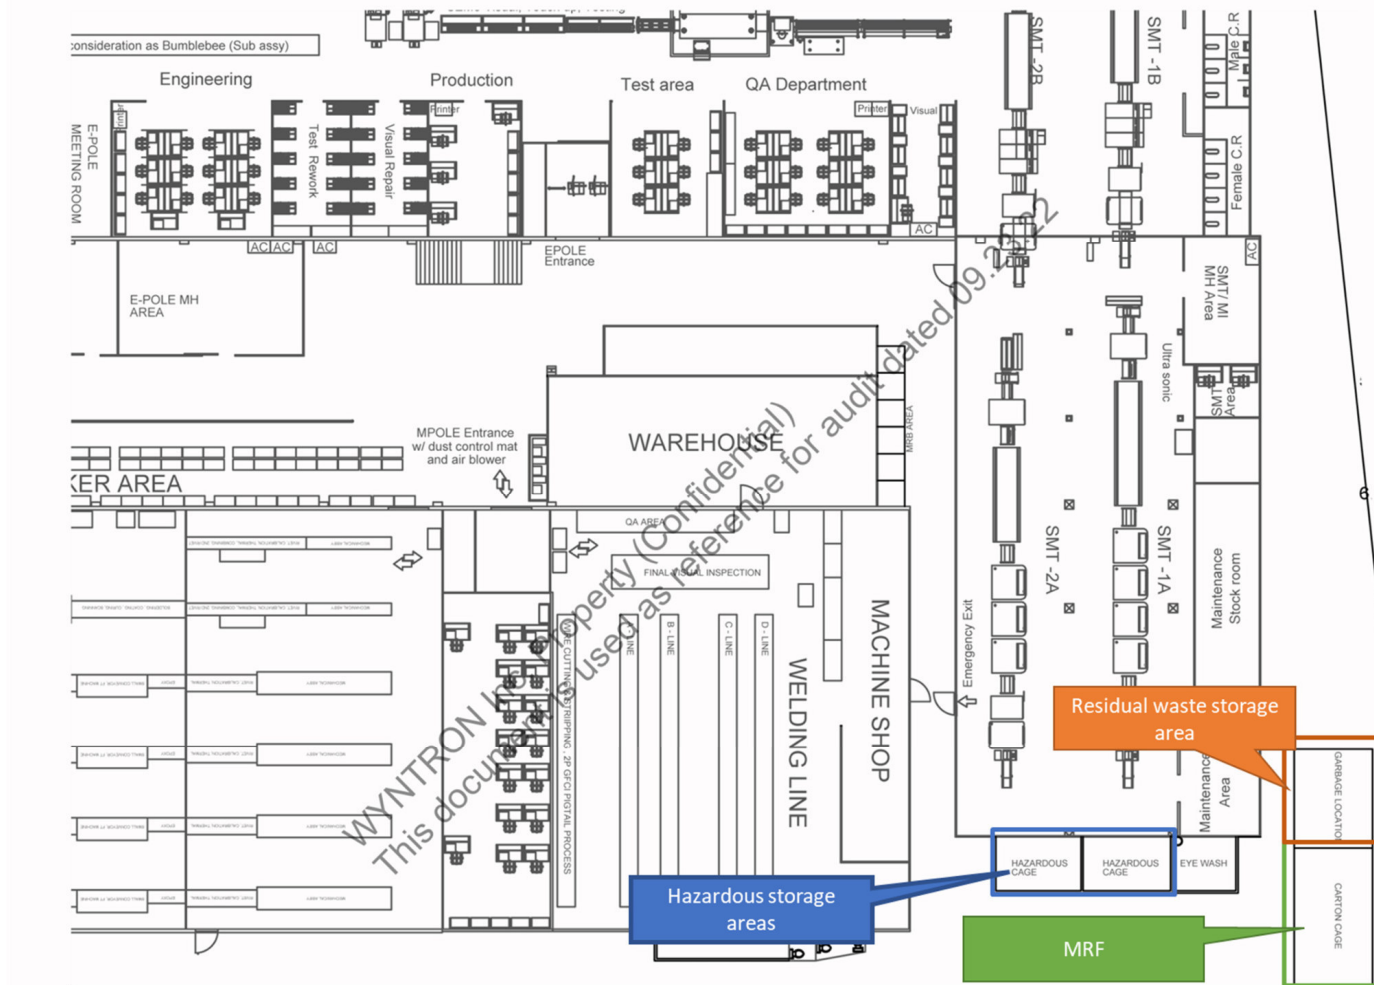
Location of MRF, Residual Waste Storage Area and Hazardous Waste Storage Area in Plant 2
